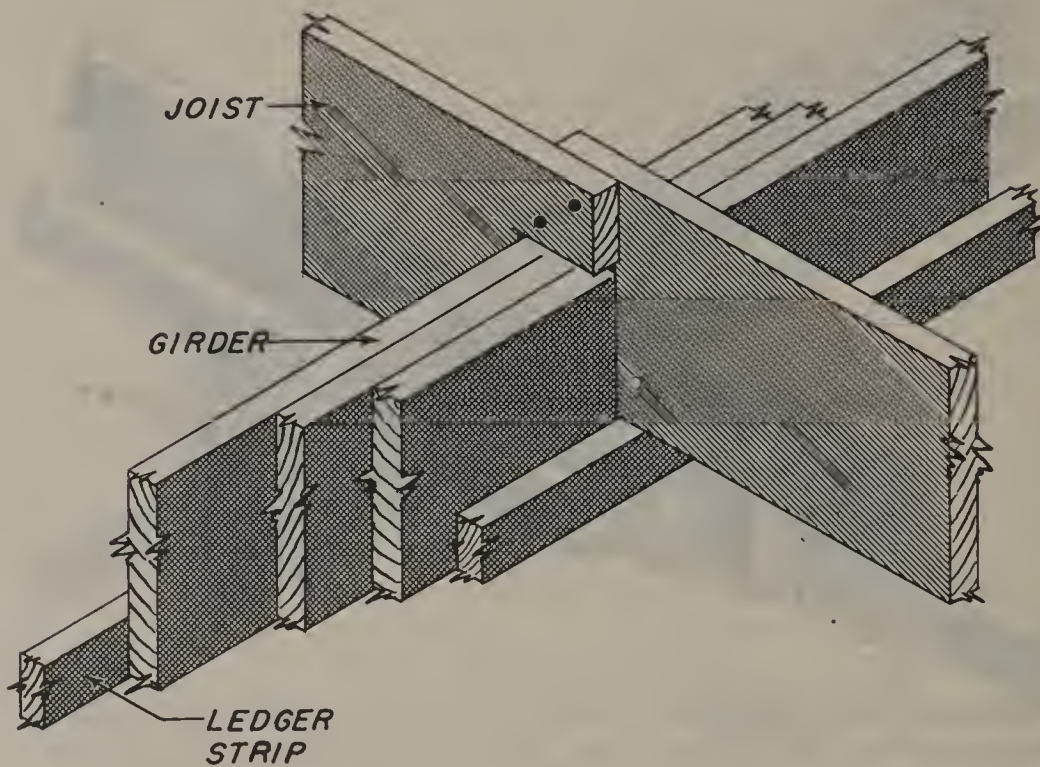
Overlapping joists notched over girder and bearing on ledger strip. Each joist toenailed to girder with one tenpenny nail and joist nailed together with two tenpenny nails. Note: Clearance is provided in the notch over the girder so that the joists bear only on the ledger strip.
